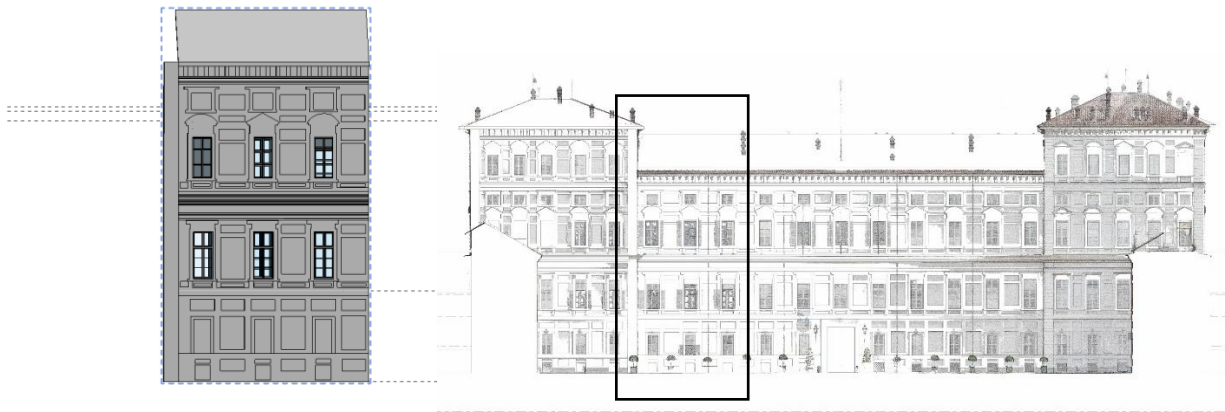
South Façade LOG. The South Façade's high-precision HBIM geometry, which was modelled at LOG 300-400.
